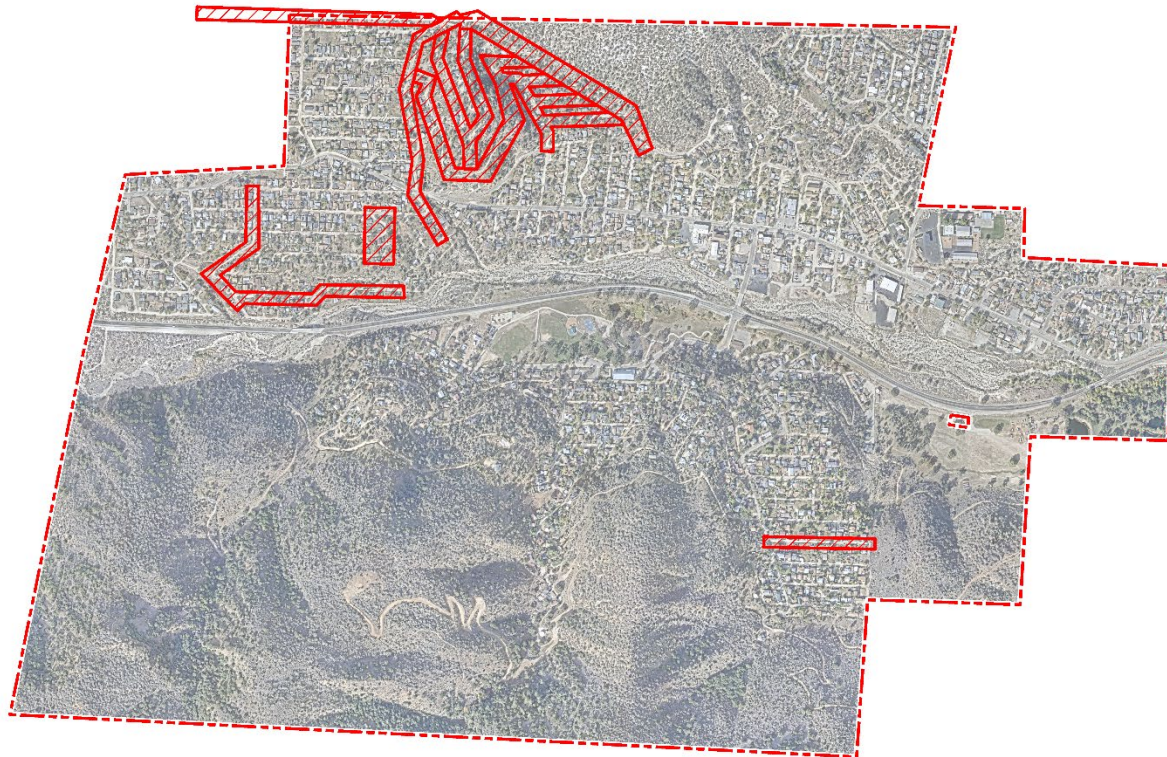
SITE PLAN – REPLACEMENT PIPELINES
